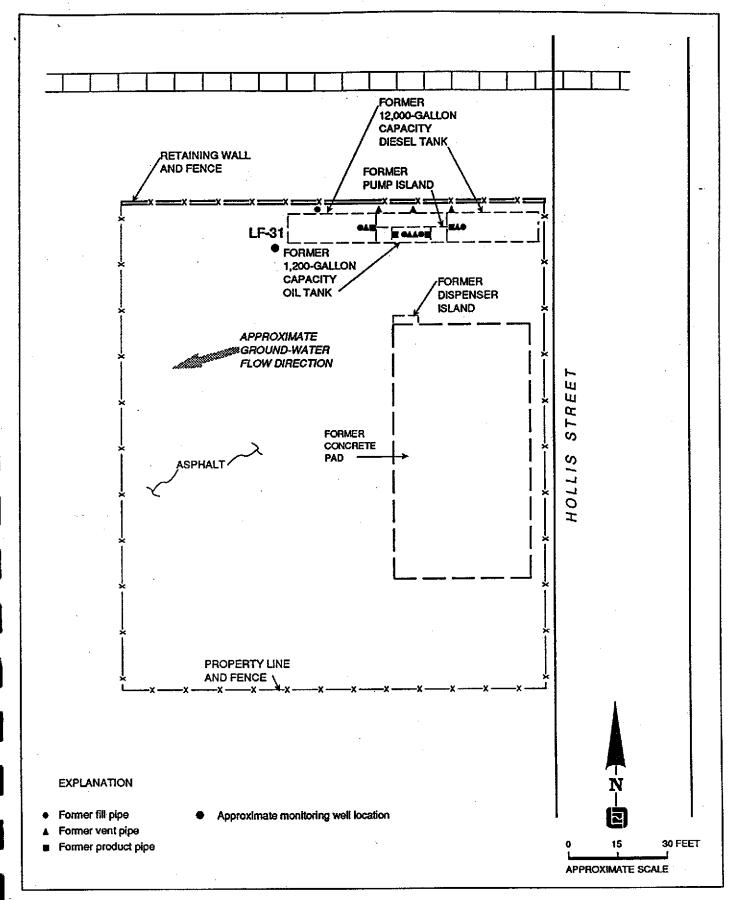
SITE PLAN SHOWING MONITORING WELL LF-31
